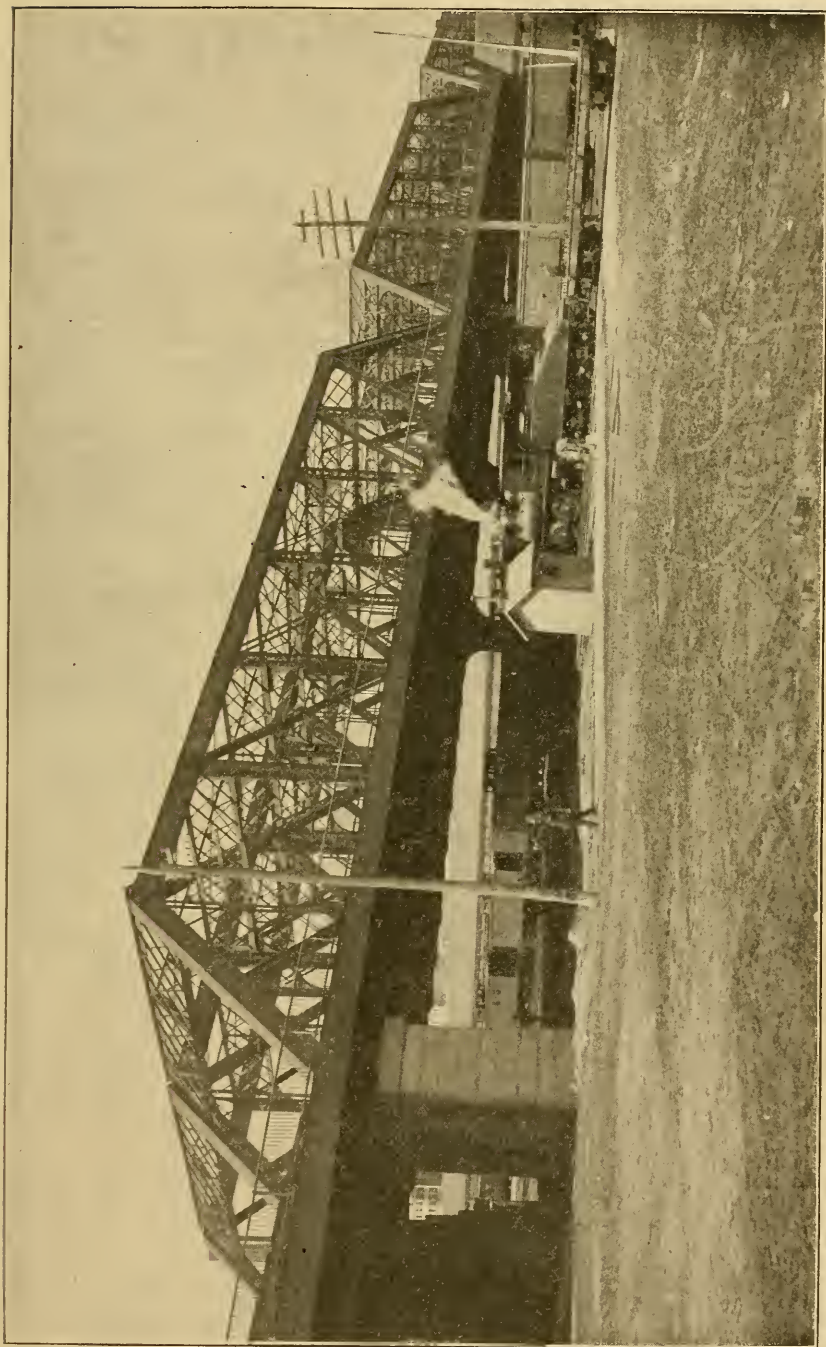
GENERAL VIEW SUMMER STREET BRIDGE OVER NEW YORK, NEW HAVEN AND HARTFORD RAILROAD.
